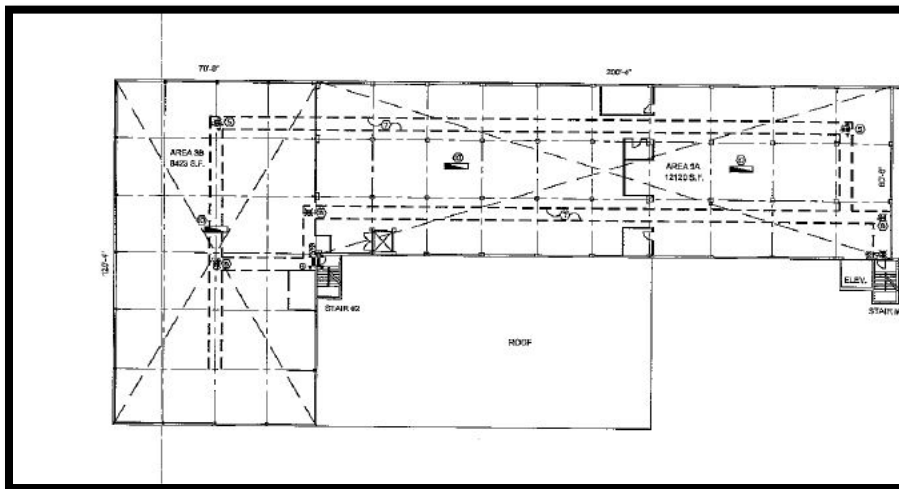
Grote Building Third Floor - the 1924 and 1925 portions of the building have a third floor.
